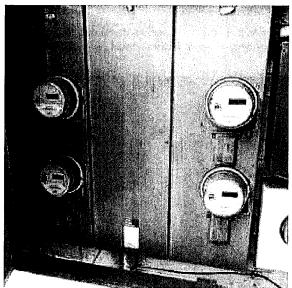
Meters are not labeled for each unit. Location is outside in a cabinet.
